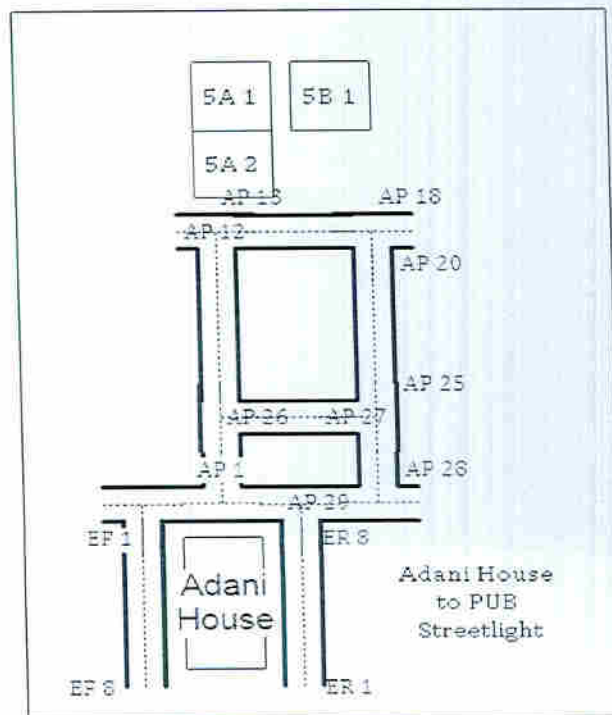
Adani House to PUB Streetlight Pole Arrangement
